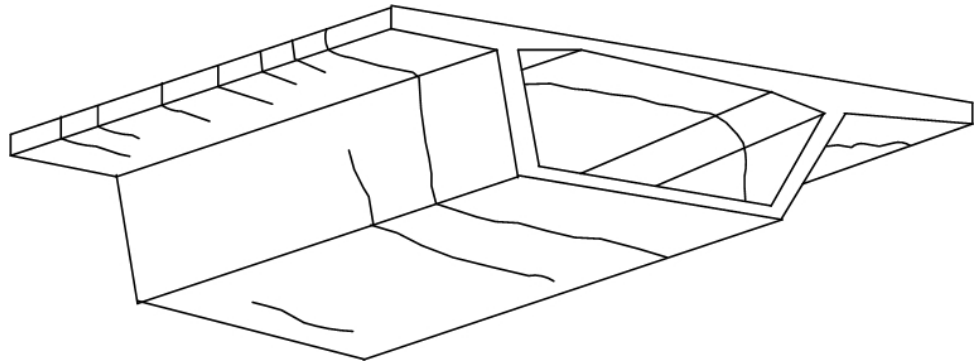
Box Girder Cracks Induced by Direct Tension
